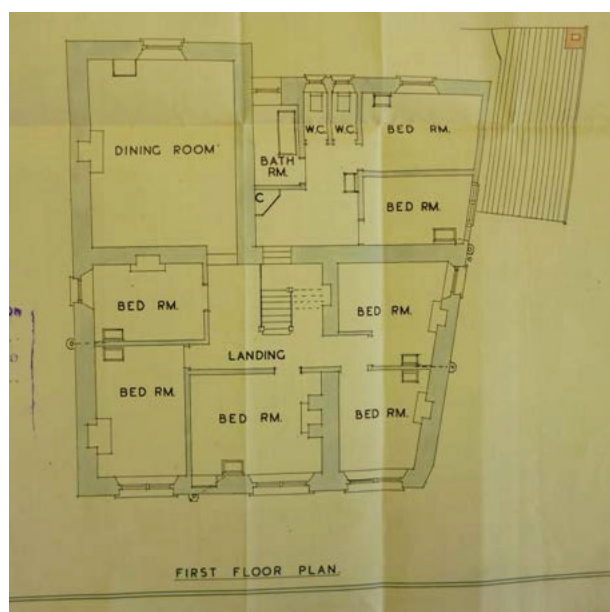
(right): Proposed first floor plan (CAC(B) BSRDNL/3/1681 1939)
